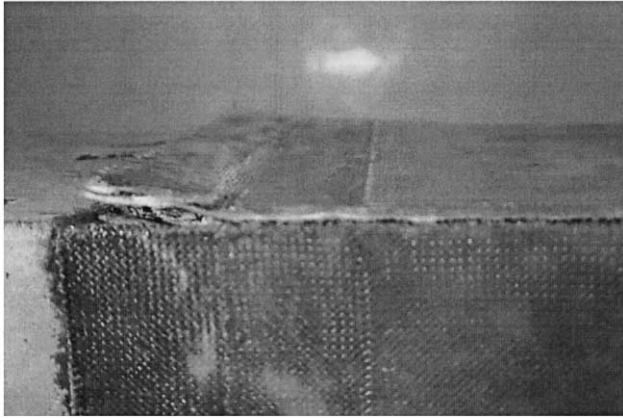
Peel-off failure of a glass fibre composite strengthened concrete beam.
